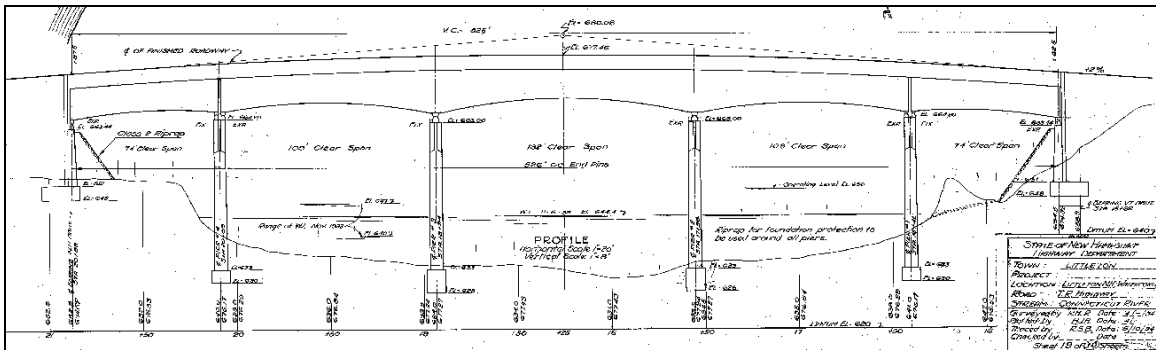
Elevation drawing from original bridge plans, Sheet 19 of 30, May 1934 (NHDOT 1934).
